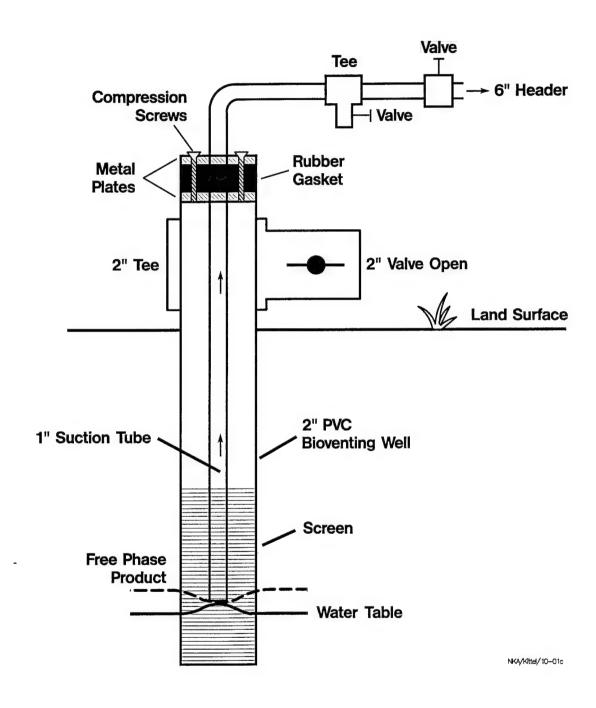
Slurper Tube Placement and Valve Position for the Skimmer Pump Test
